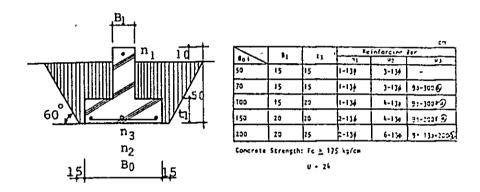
RC-CONTINUOUS FOUNDATION DETAIL
